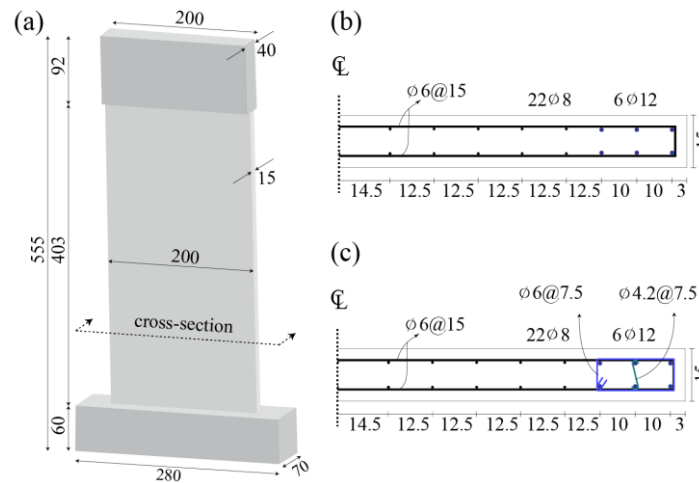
Geometry of selected specimens: (a) Dimensions in centimeters; (b) cross-section specimen WSH4; (c) cross-section specimen WSH3
